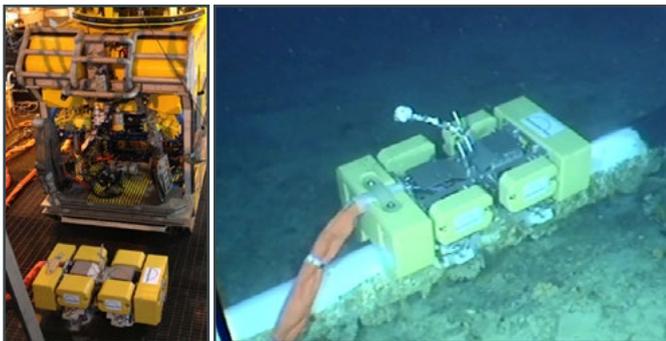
Left: the inspection tool (modified MEC™-Combi Crawler) lying in front of a work class ROV. Right: Tool deployed on subsea pipeline scanning over the pipeline
